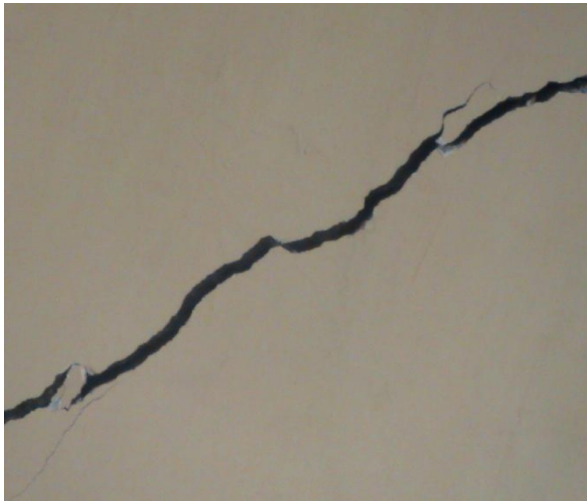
Crack 3 (First Floor) Figure 6: Crack 4(First Floor)
